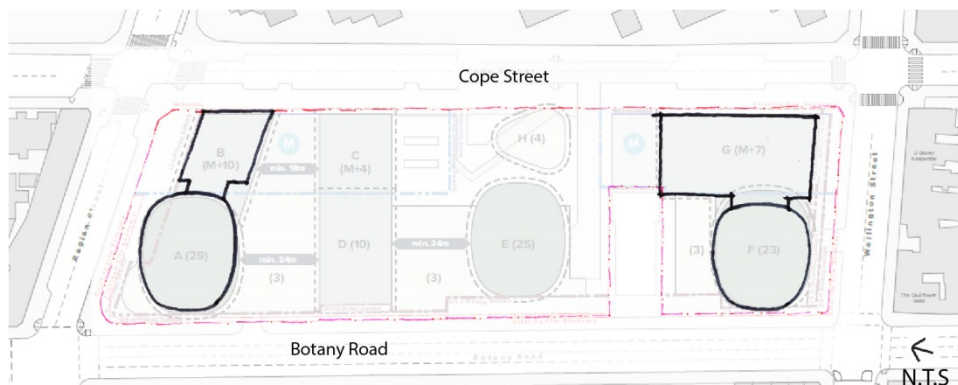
Potential articulation between towers and the built forms above Metro Boxes (Adapted from Turner and Turf)
